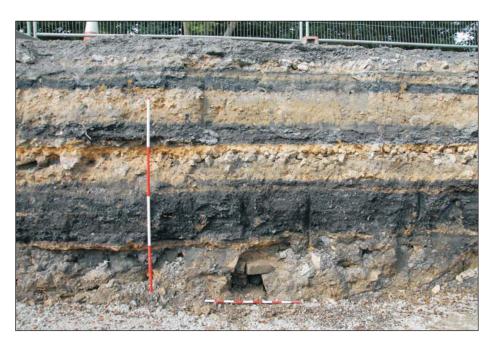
Detail of east facing section of Trench 1 showing sequence of road surfaces and culvert at the base
